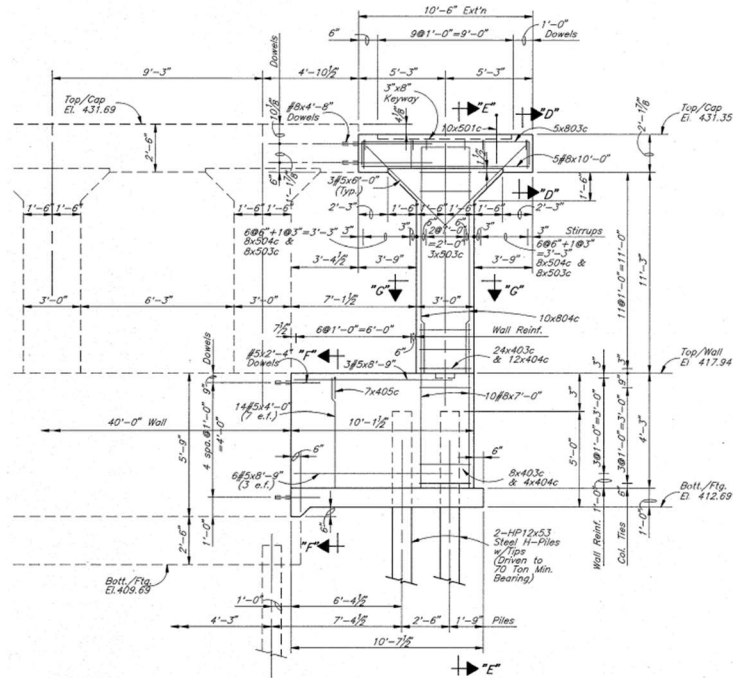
Transverse Elevation of Interior Pier Column Addition of Bridge (NBI 14650) (1991).
